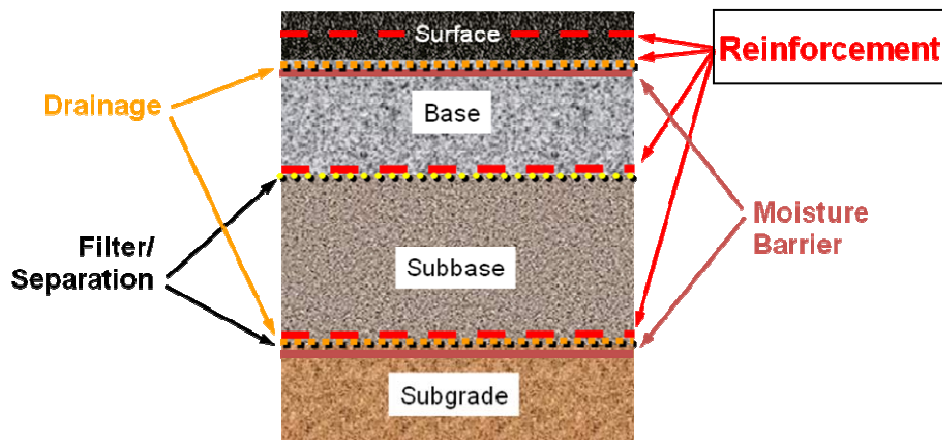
Potential applications of geosynthetics in a layered pavement system.
